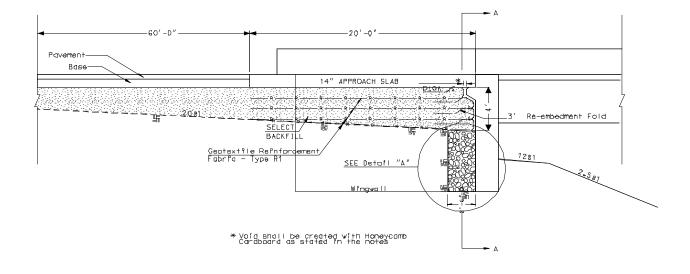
Detail for Fabric Reinforced Backfill under the Approach Slab
